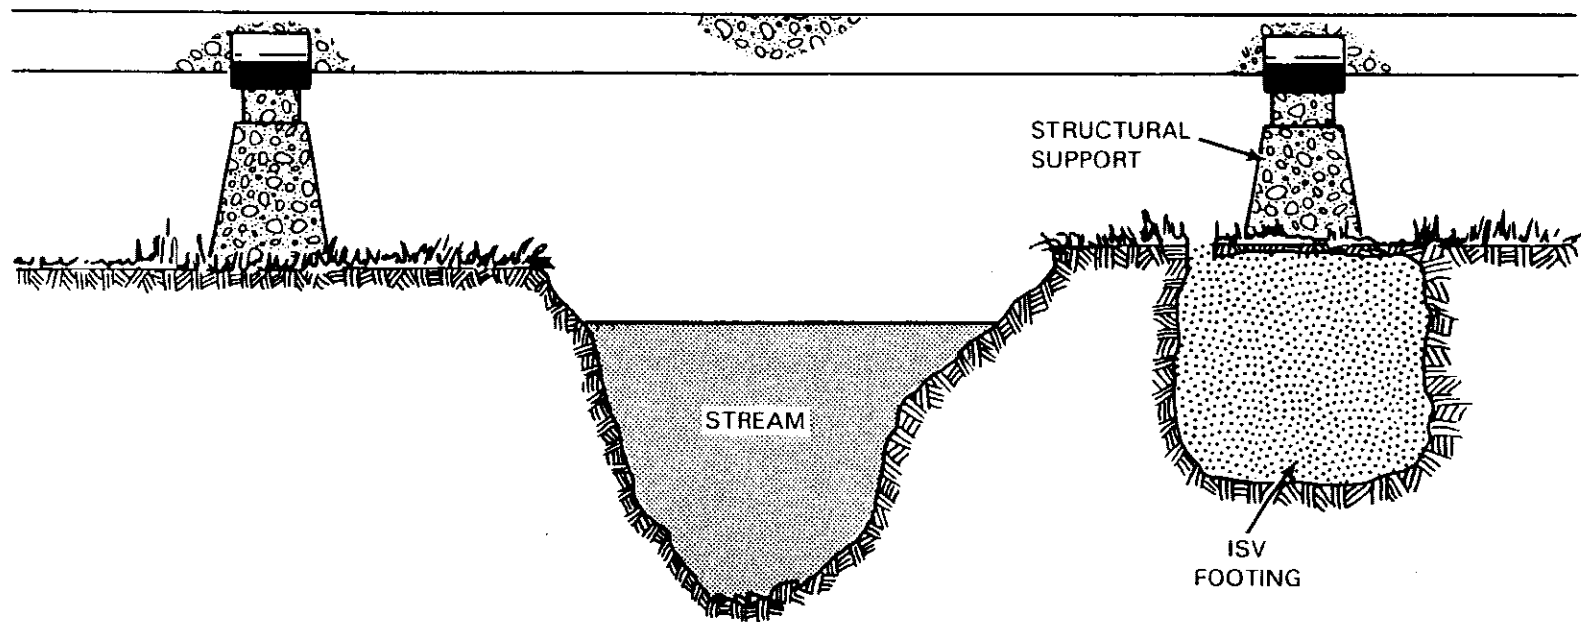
Generation of Soil Stabilization/Footing and Foundation
